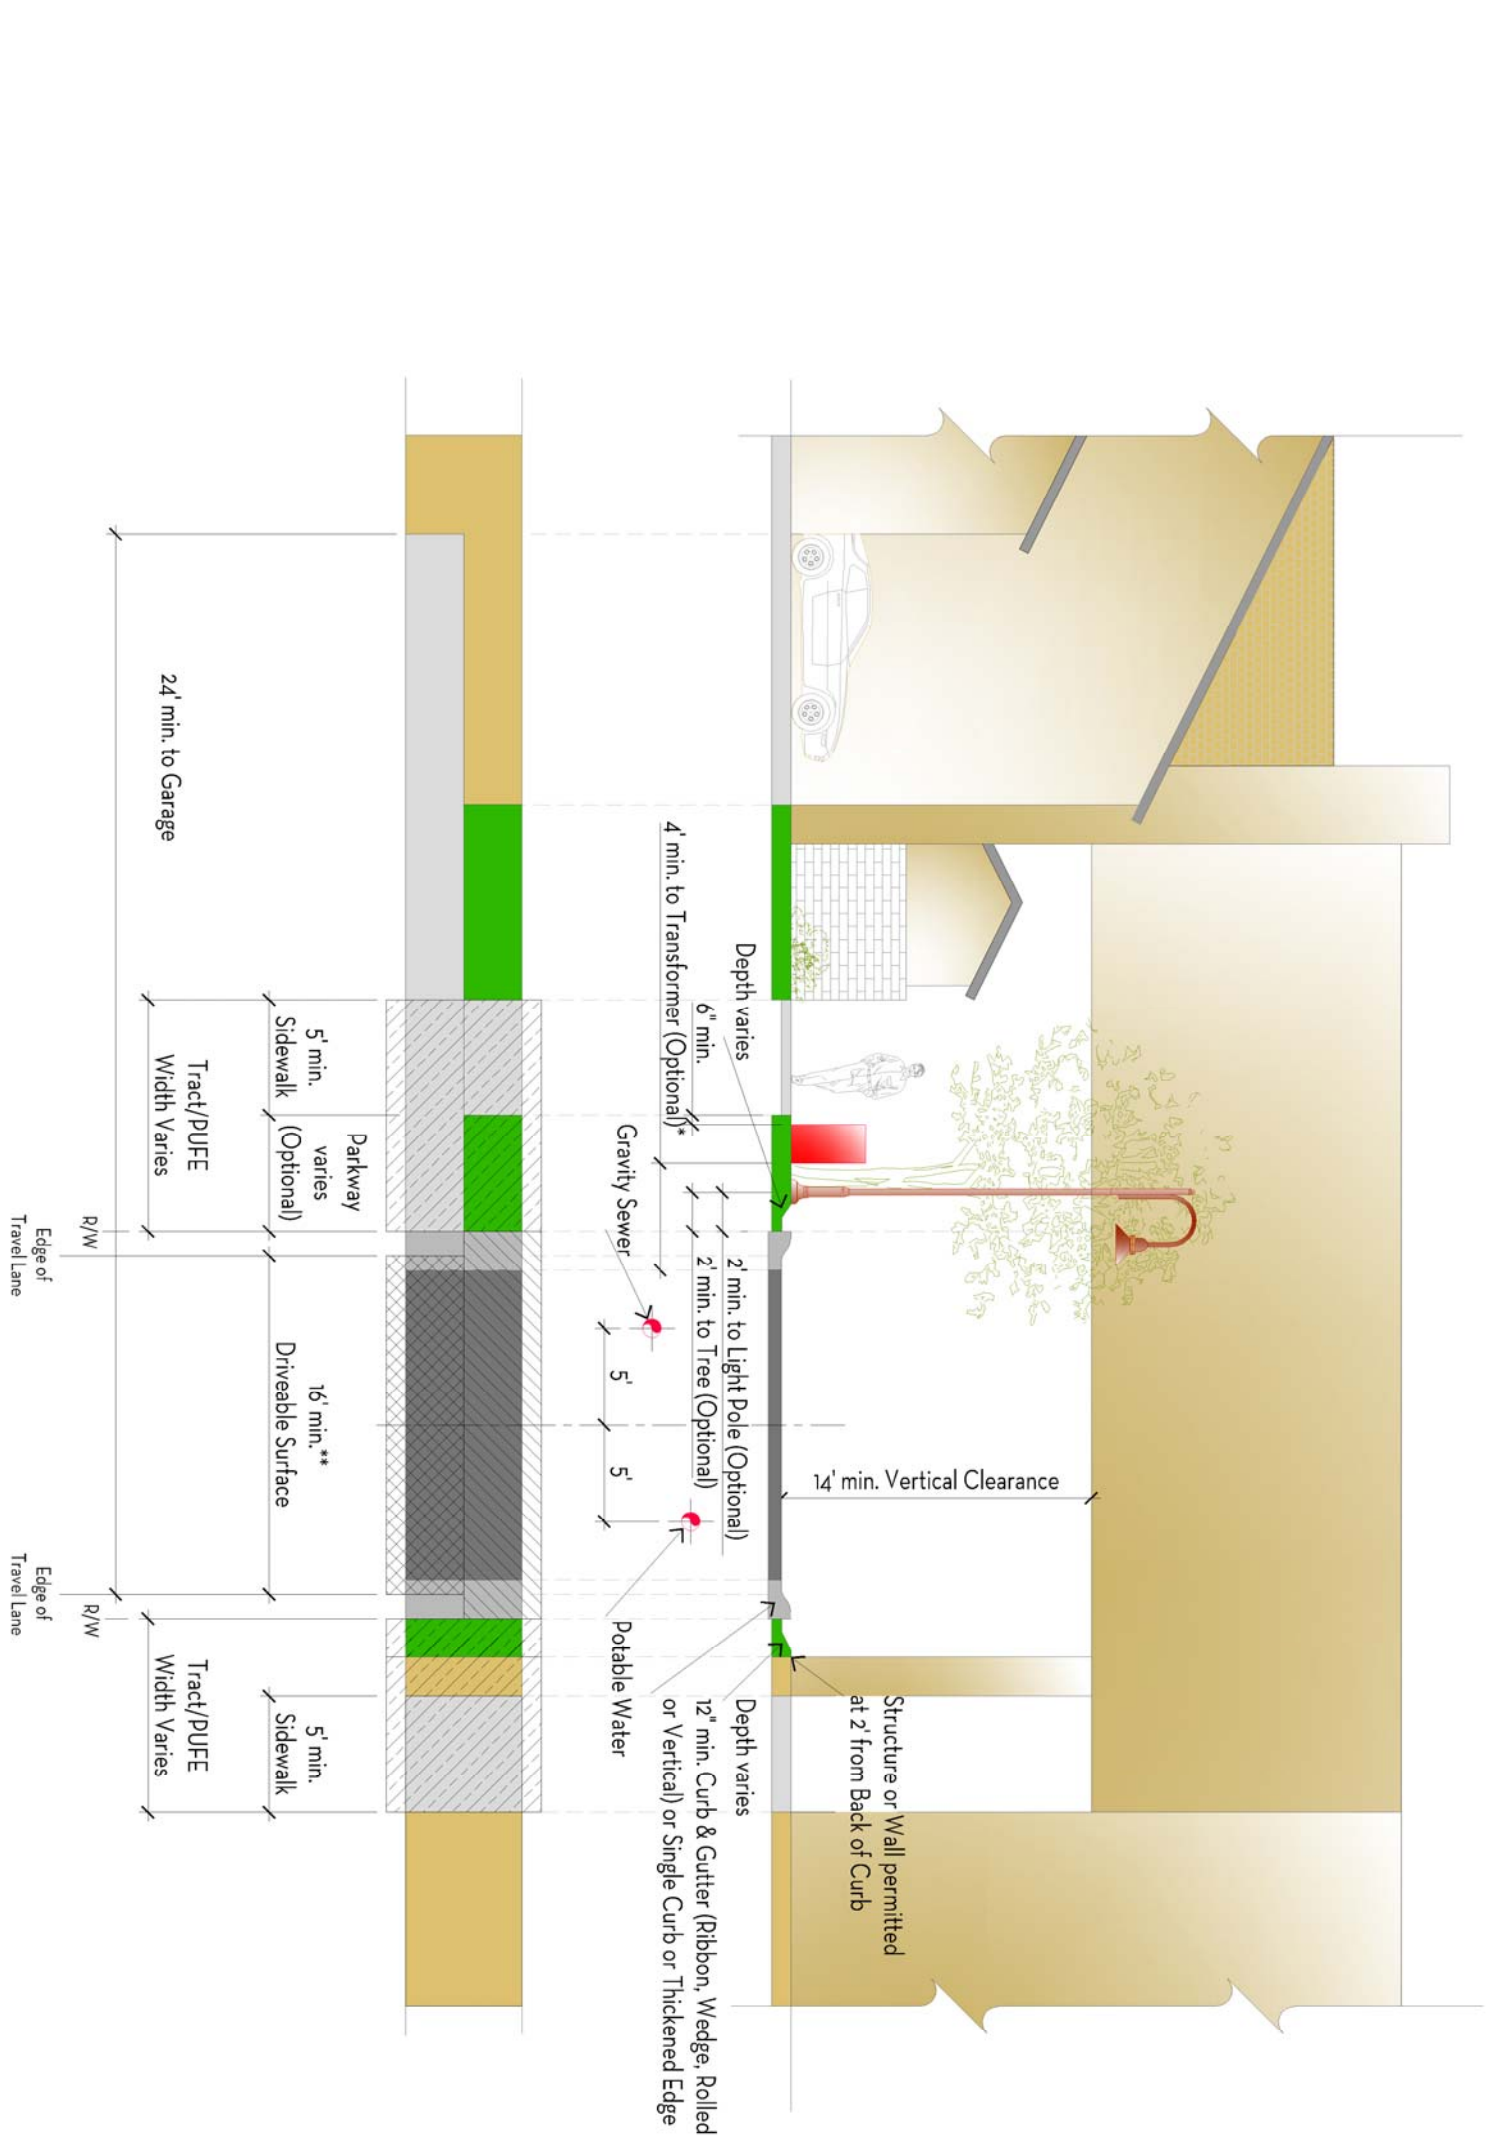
Two-Way Neighborhood Street - Detailed Cross Section
